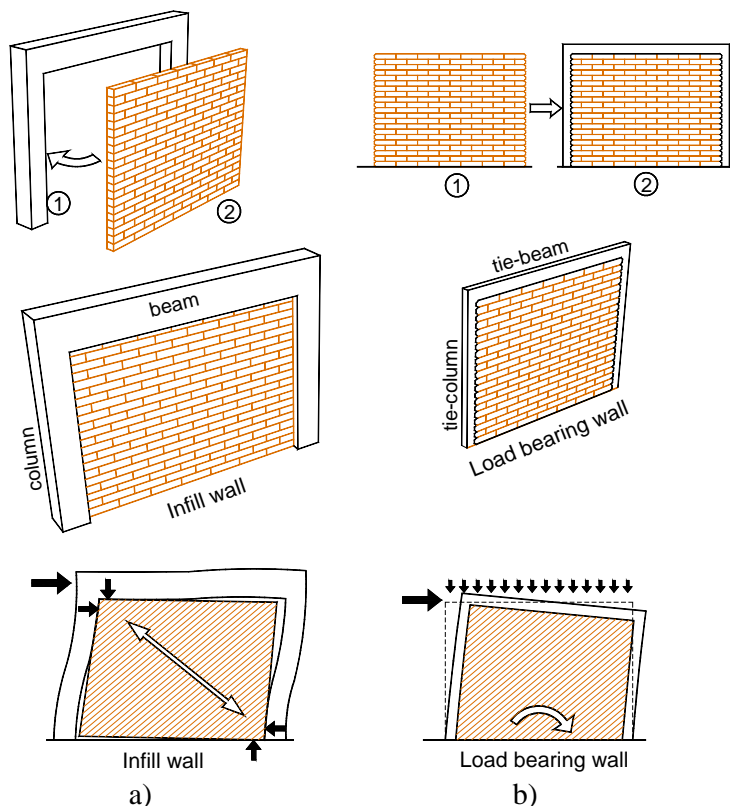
A comparison of RC frames with masonry infills (a), and confined masonry construction (b): construction sequence (top); size of confining elements (middle), and the seismic response (bottom) (EERI, 2011)
